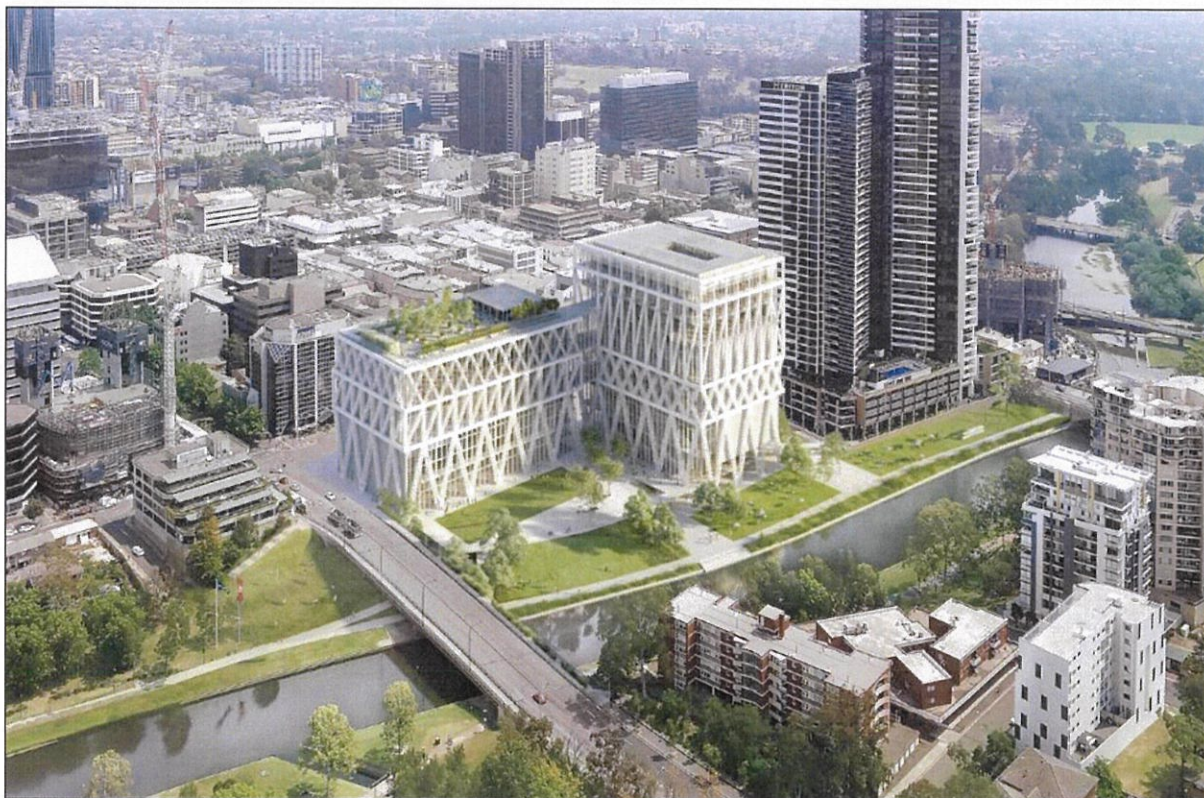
| Elevated perspective looking south-west across Parramatta River towards the development (Base source: Applicants RtS)
